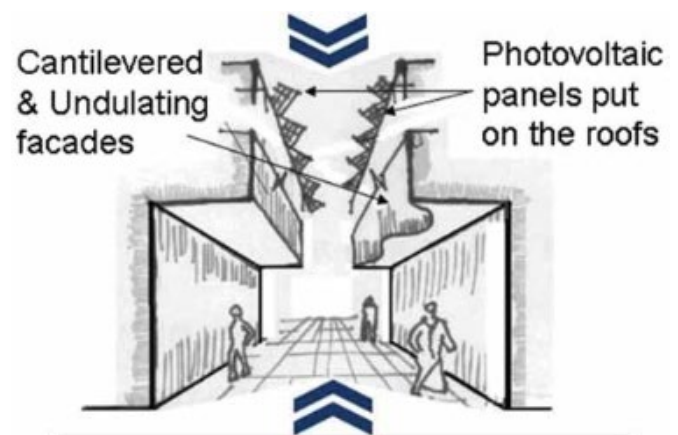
Undulating and Cantilevered Residential Façade<sup>[23]</sup>
